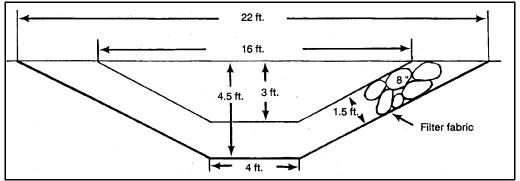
Typical dimensions and installation details of a channel with riprap lining (Source: Indiana Erosion Control Handbook)
